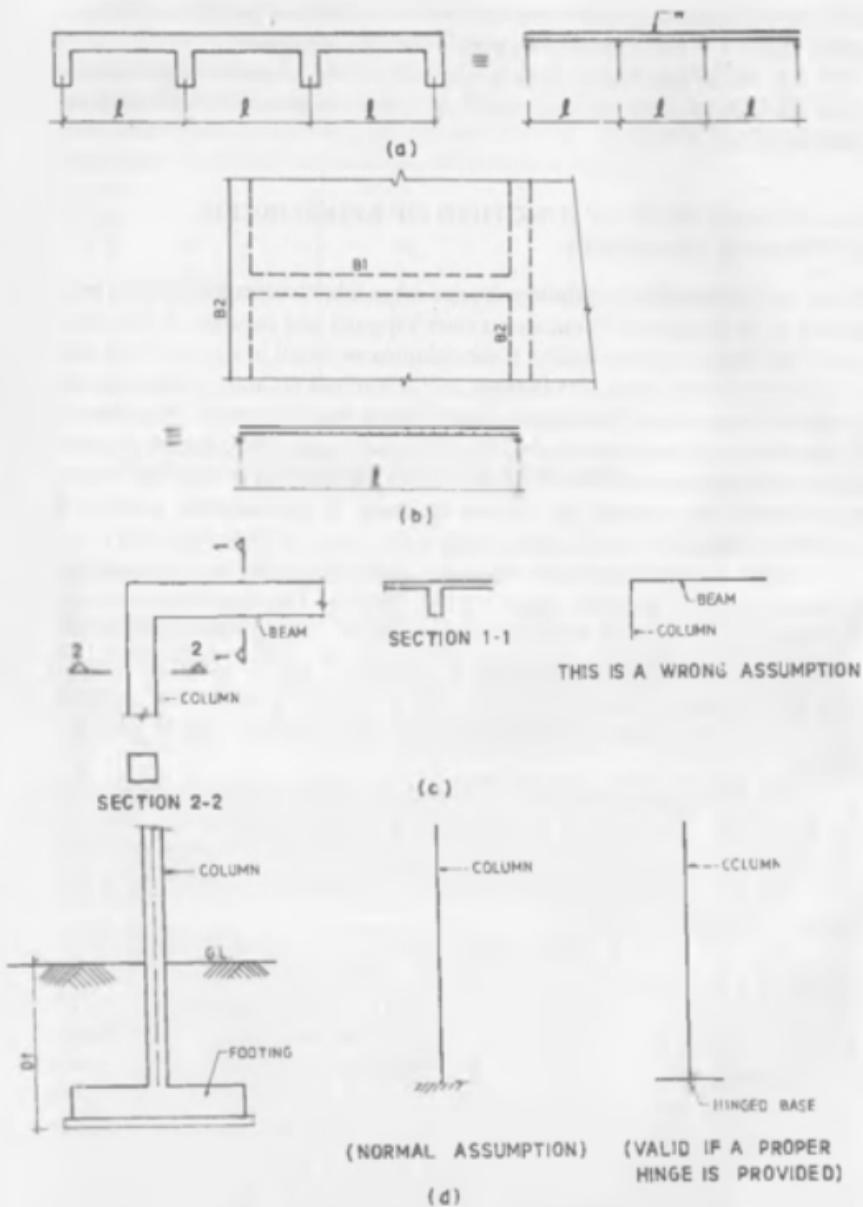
Interaction of RC elements at junctions. (a) Slab and beam junctions; (b) Plan of beam-to-beam junction; (c) Column-beam junction; (d) Column footing junctions.
